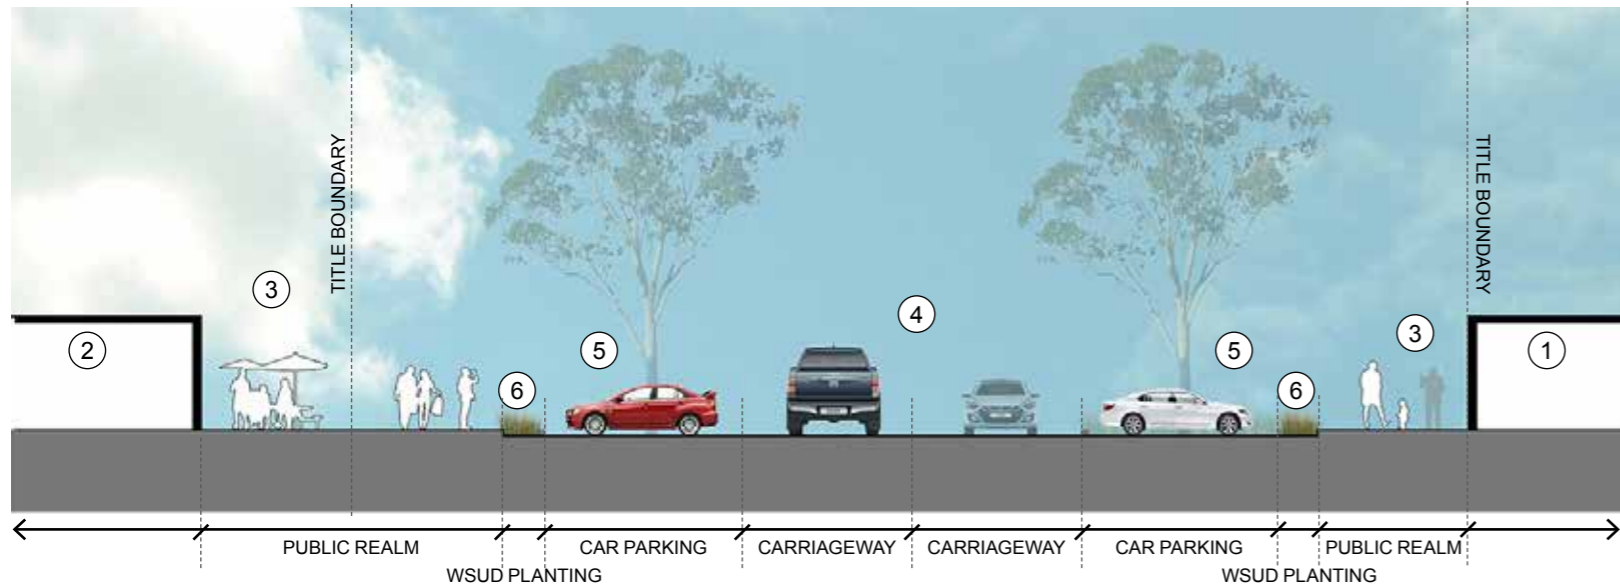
Kinglake proposed streetscape section (EE)
